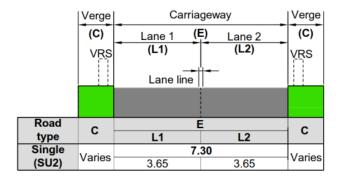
All-Purpose Single Carriageway Cross-Section (DMRB CD127, 2.1.1N1g)
